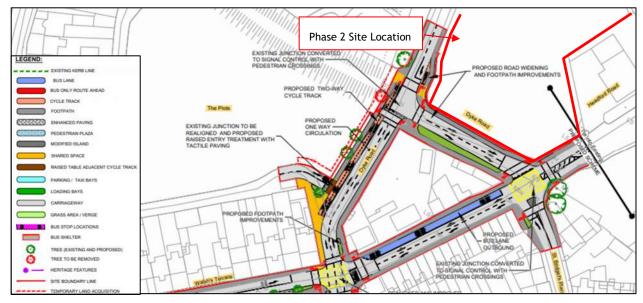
Extract from Bus Connects Route Beside Proposed Site (Ref: NTA Sheet 3)
